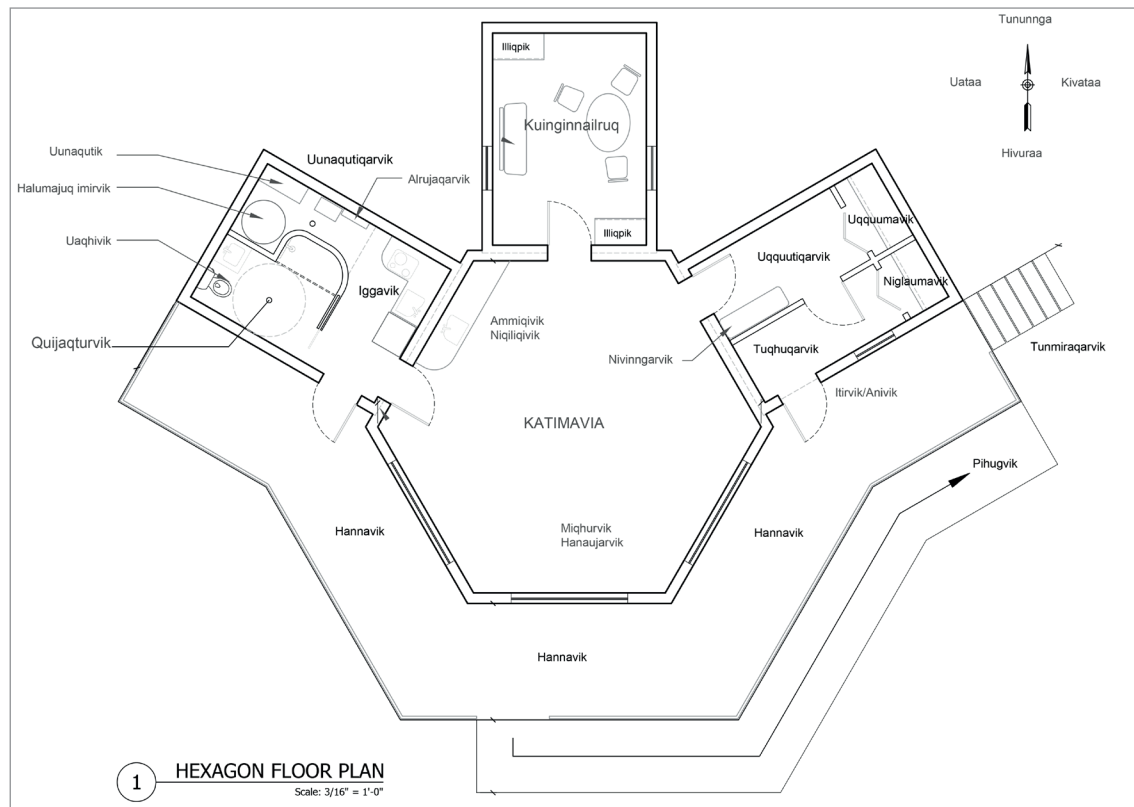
A PRELIMINARY FLOORPLAN. INUINNAQTUN TERMINOLOGY WAS USED TO DEFINE THE SPACES AND ACTIVITY AREAS. | PI/KHS AND SAIT GBTAC BUILDING PLANS AND BLUEPRINTS. ON FILE AT PI/KHS ARCHIVES.
